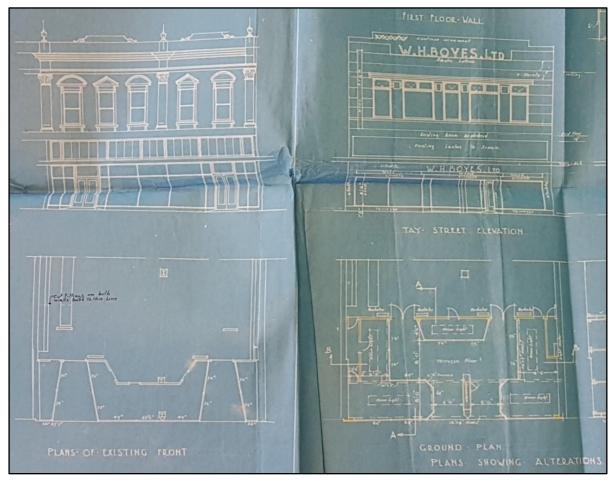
Detail from 1943 plan of W. H. Boyes premises at 22 Tay Street, showing the alterations to the shop's street façade, and alterations to the floor plan (E. Smith, 1943).
